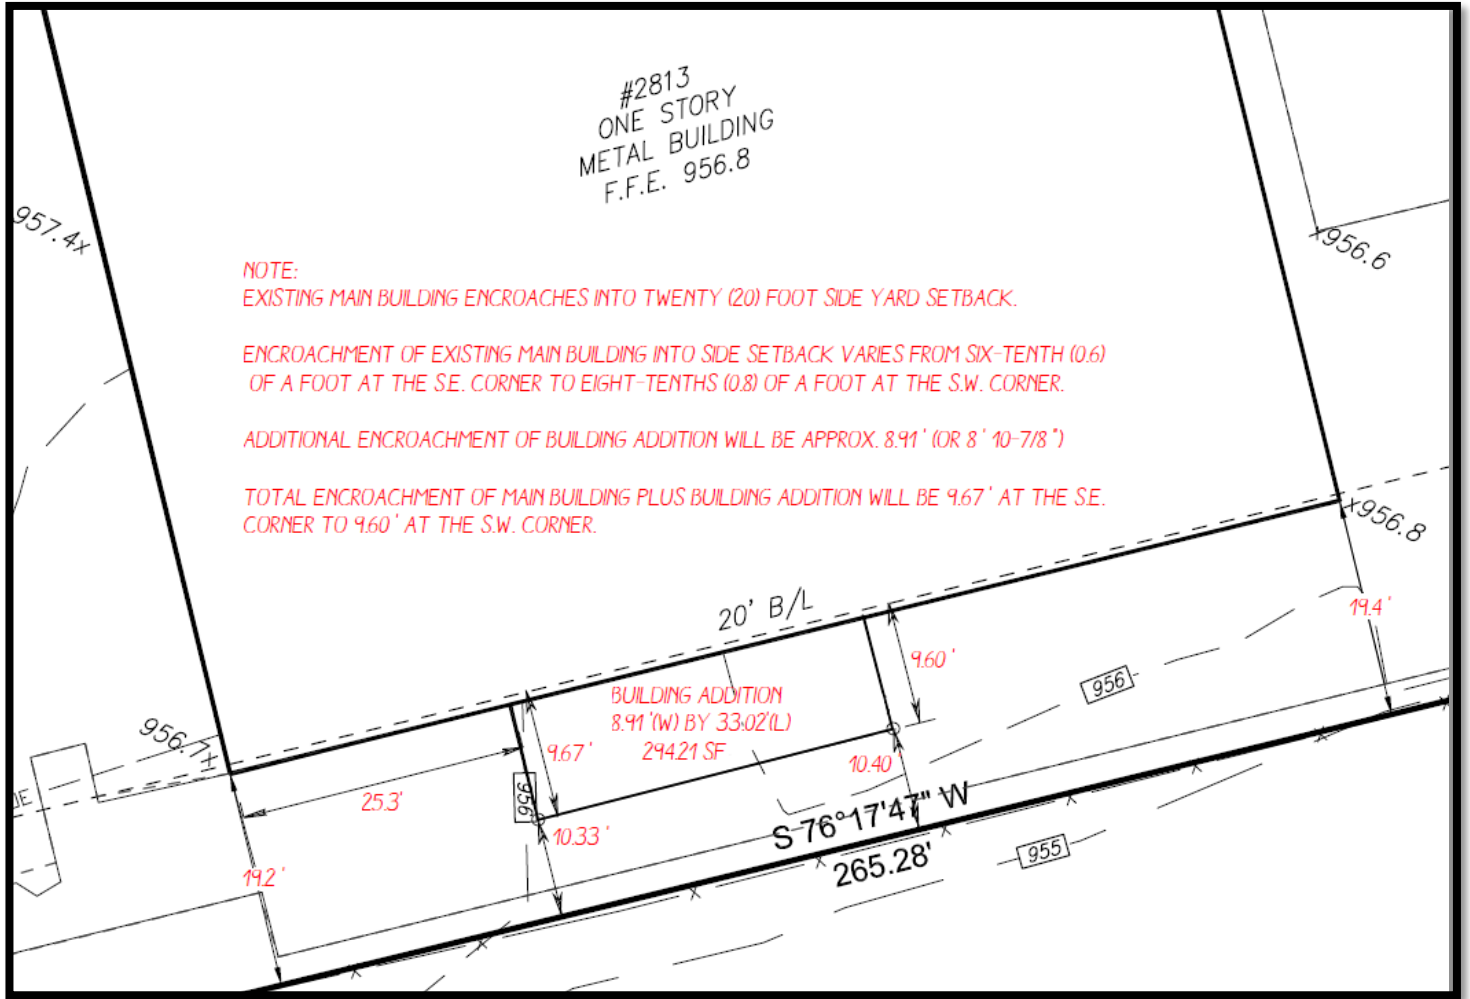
V-21-004 Variable Steel Conceptual Site Plan enlargement showing dimensions. See attachments for full conceptual site plan.
